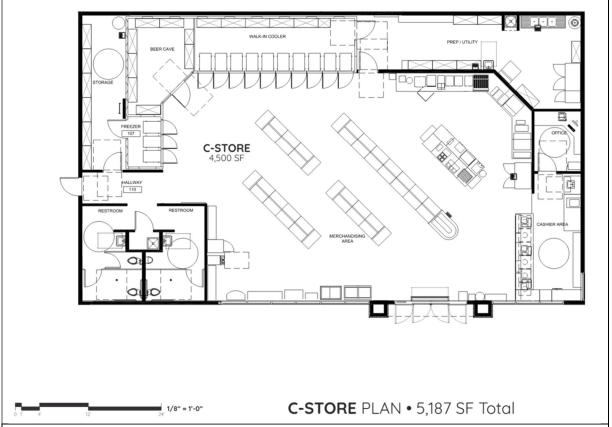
3,854 Sq. Ft. Floor Plan 3,854 sq. ft. floor plan included in the January 21, 2025 resubmittal (and incorrectly labeled 4,500 sq. ft.). No attached carwash shown. Exterior dimensions are not provided (as required on Plan Set Checklist) so dimensions were obtained by measuring using provided scale.
